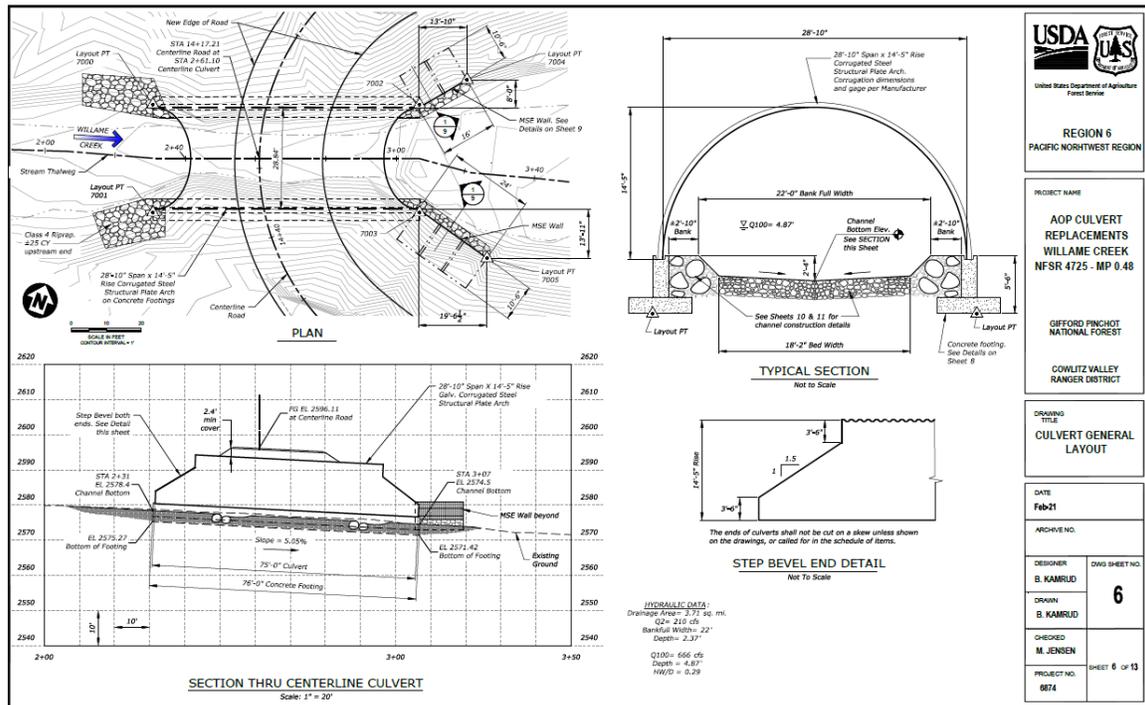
Design example of a typical open-bottomed arch structure with pre-cast concrete footings to provide AOP at all flows and life stages.
